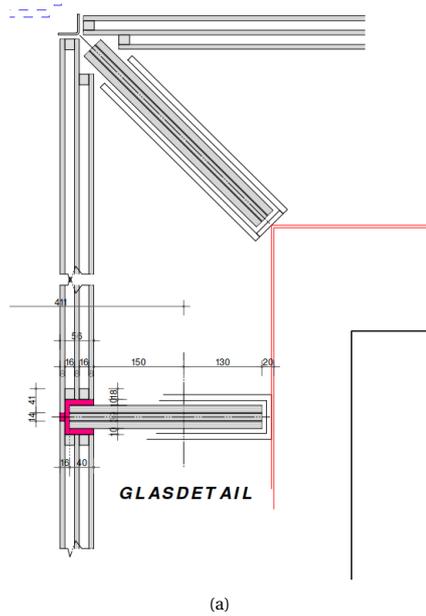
Fin-facade connection with a 2 component structural silicone sealant.
